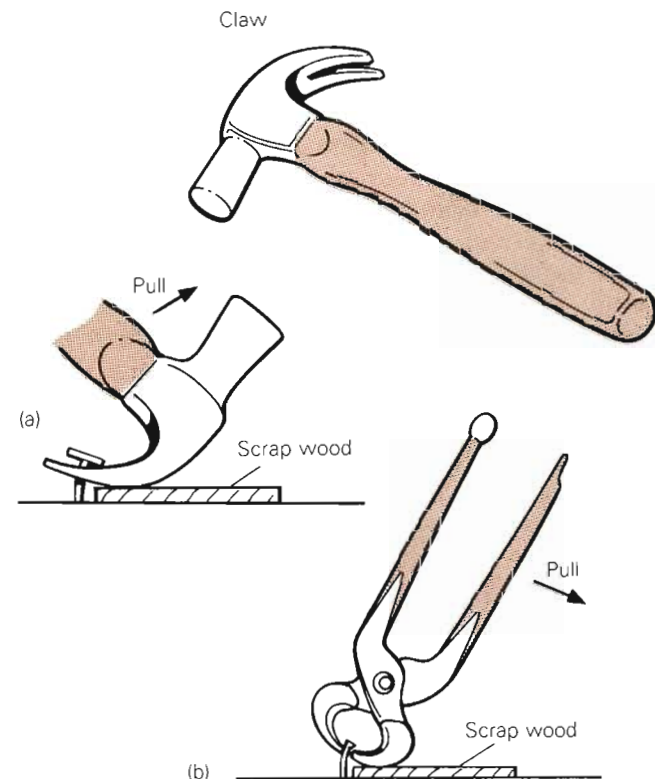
Extracting a nail: (a) using a claw hammer, (b) using pincers.
